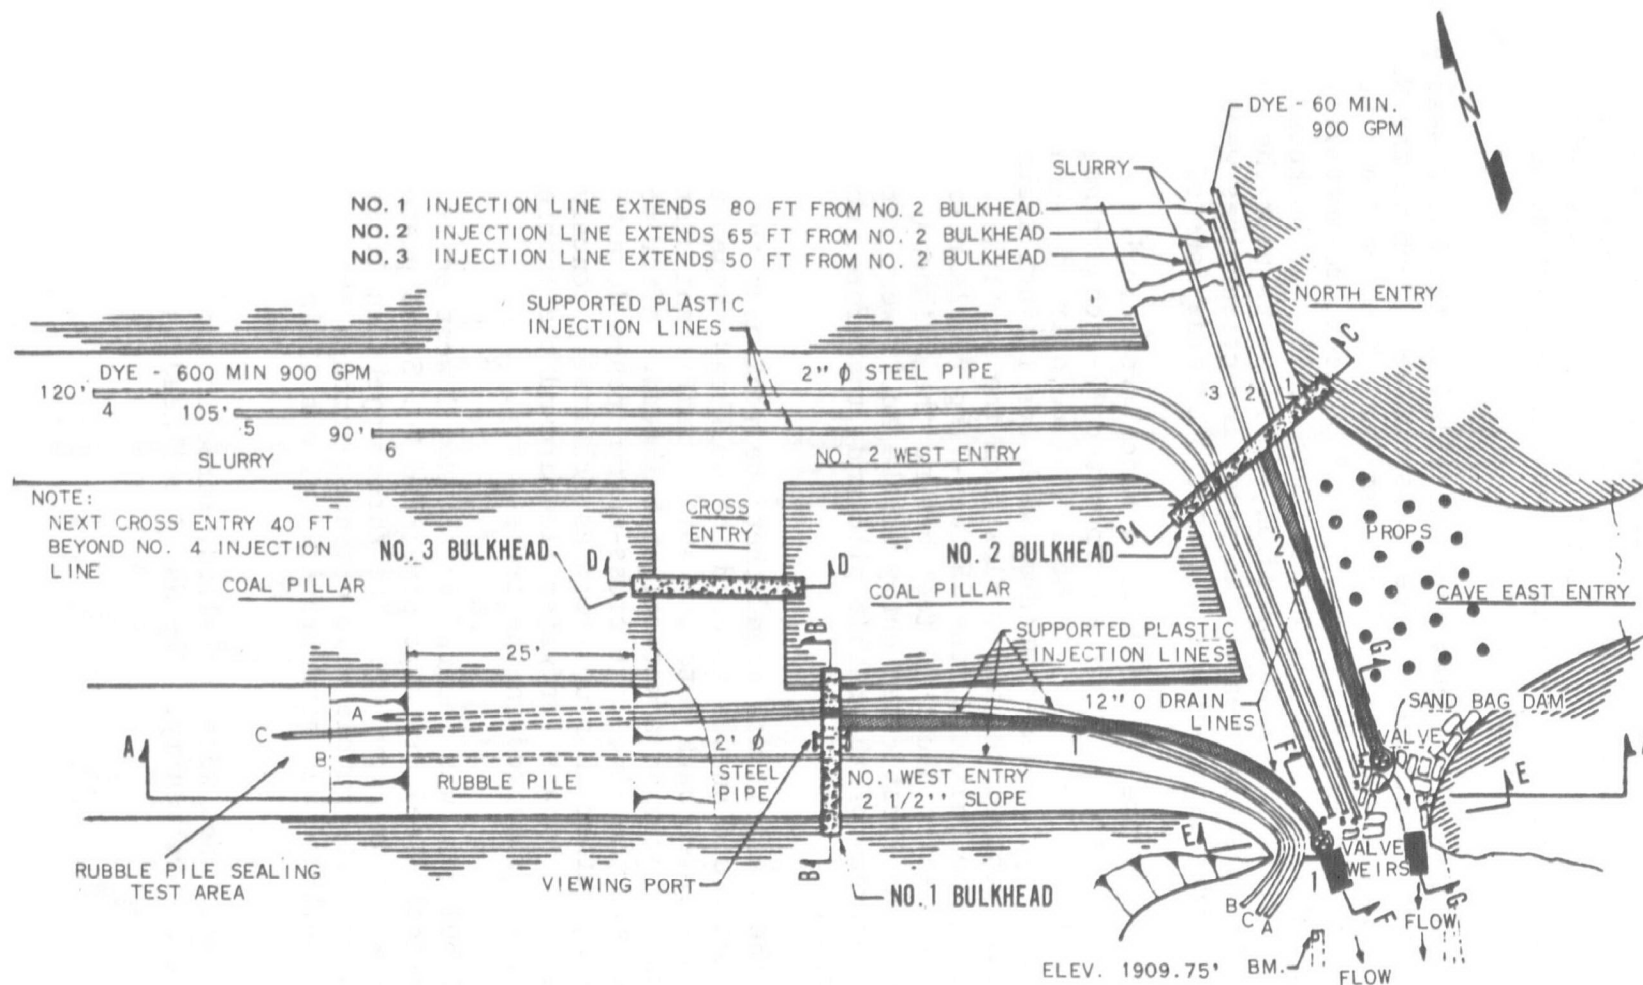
Plan of Bulkheads, Piping, Weirs and Portal
